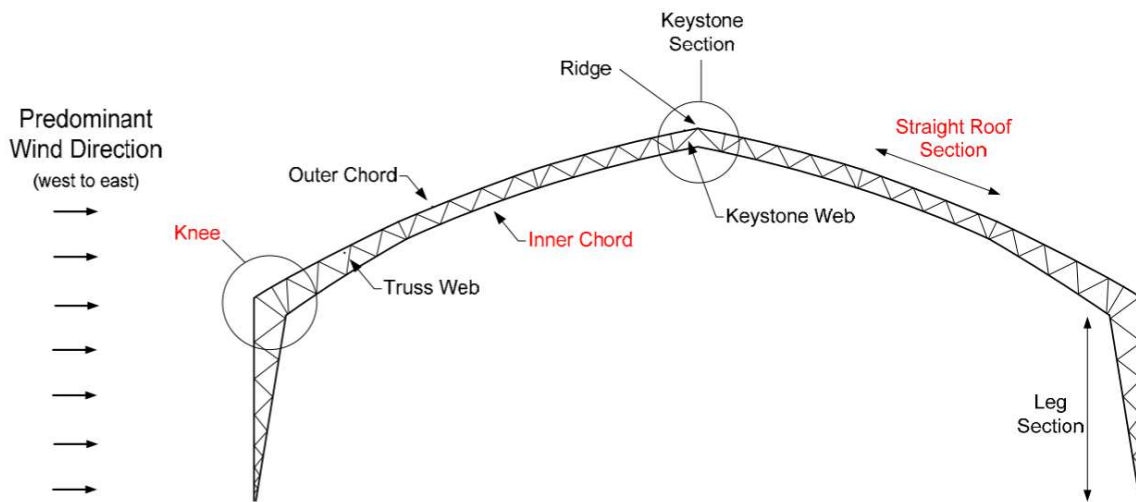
Dallas Cowboys practice facility steel frame cross-section (NIST, 2010).
